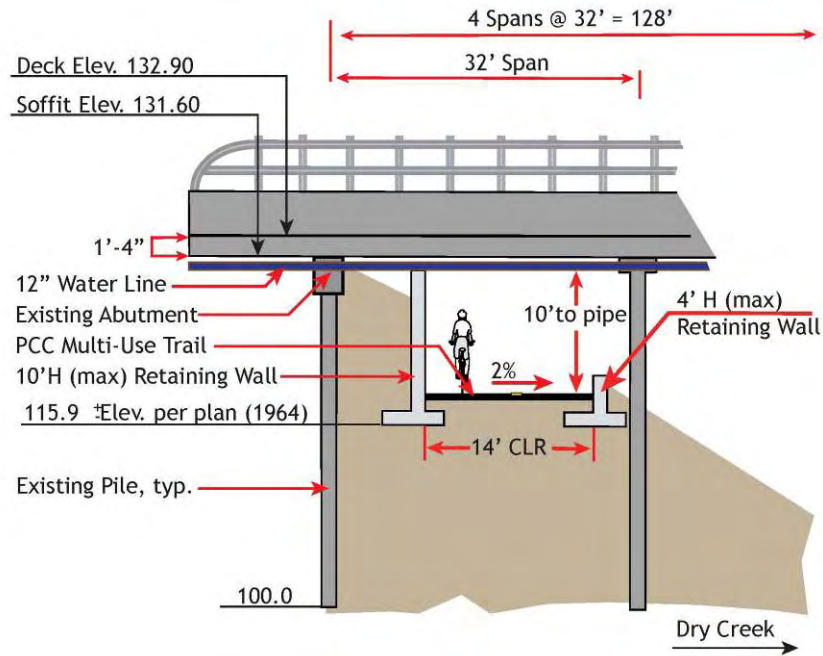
Darling Way Bridge under-crossing Path Section, looking upstream
